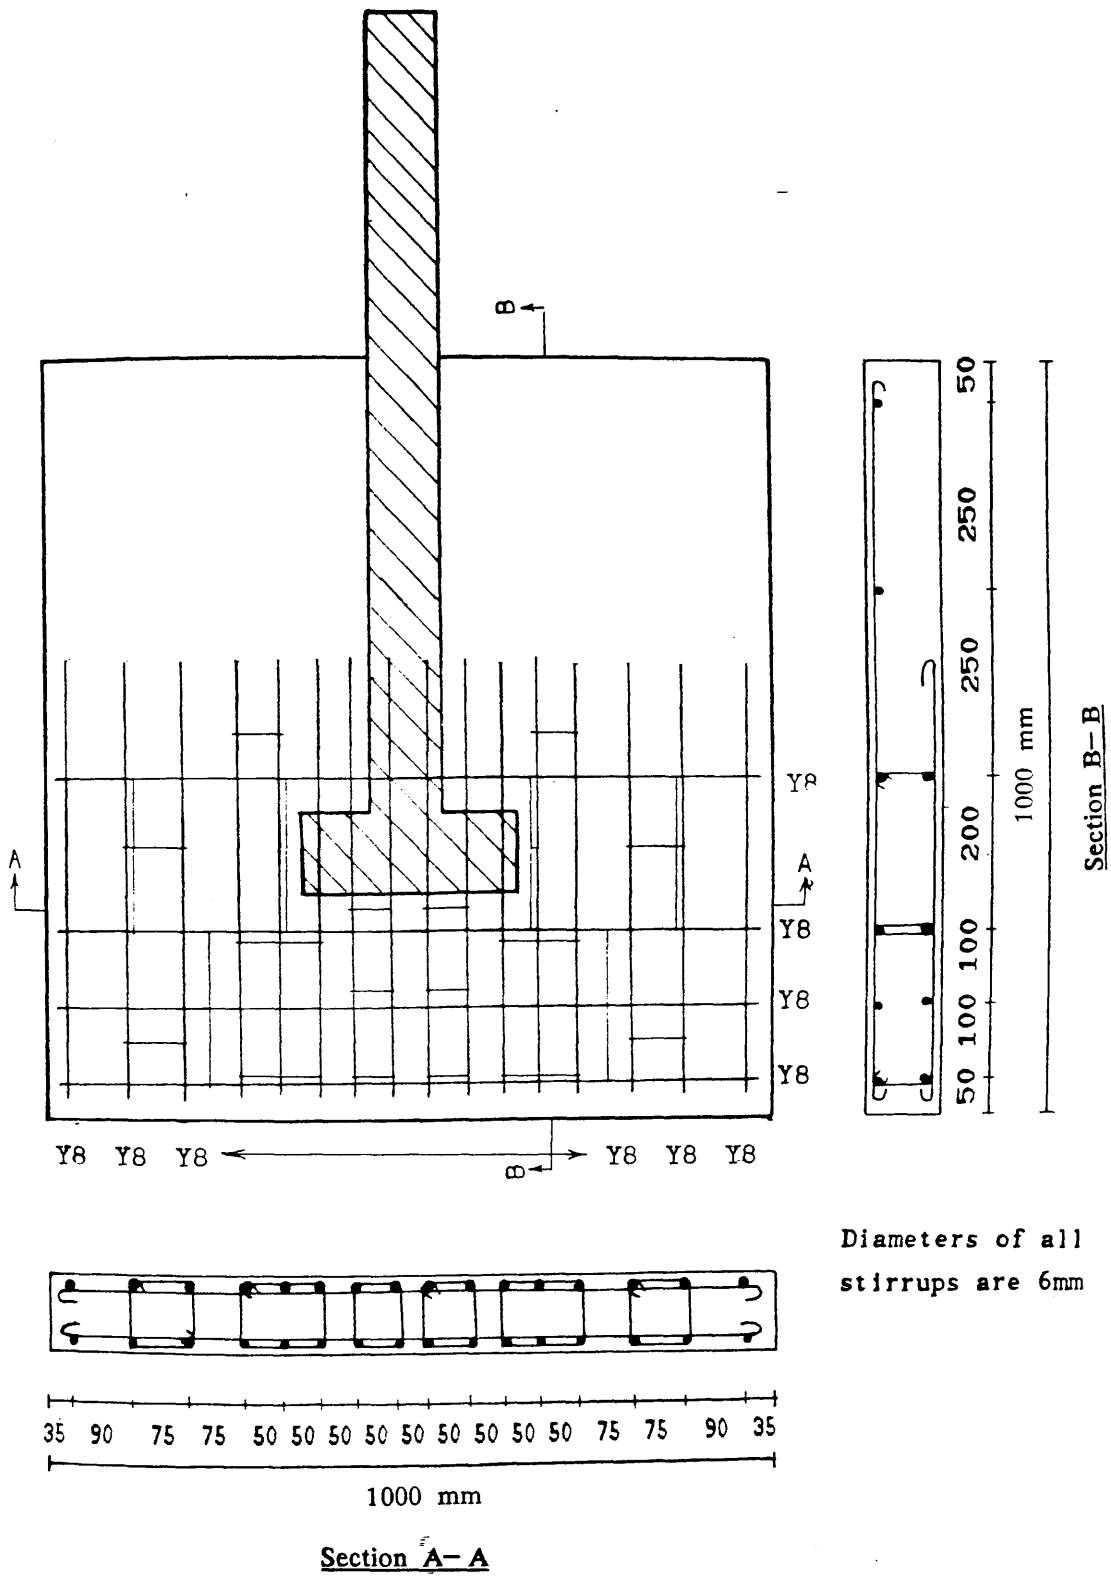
b) : Arrangement of bottom reinforcing bars including closed vertical stirrup in the slab of model MS10
